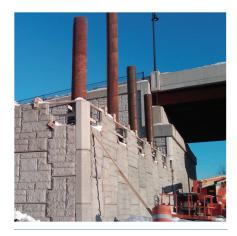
Viaduct Foundations at MSE wall interface. Viaduct foundations will not bear on the MSE embankments.
